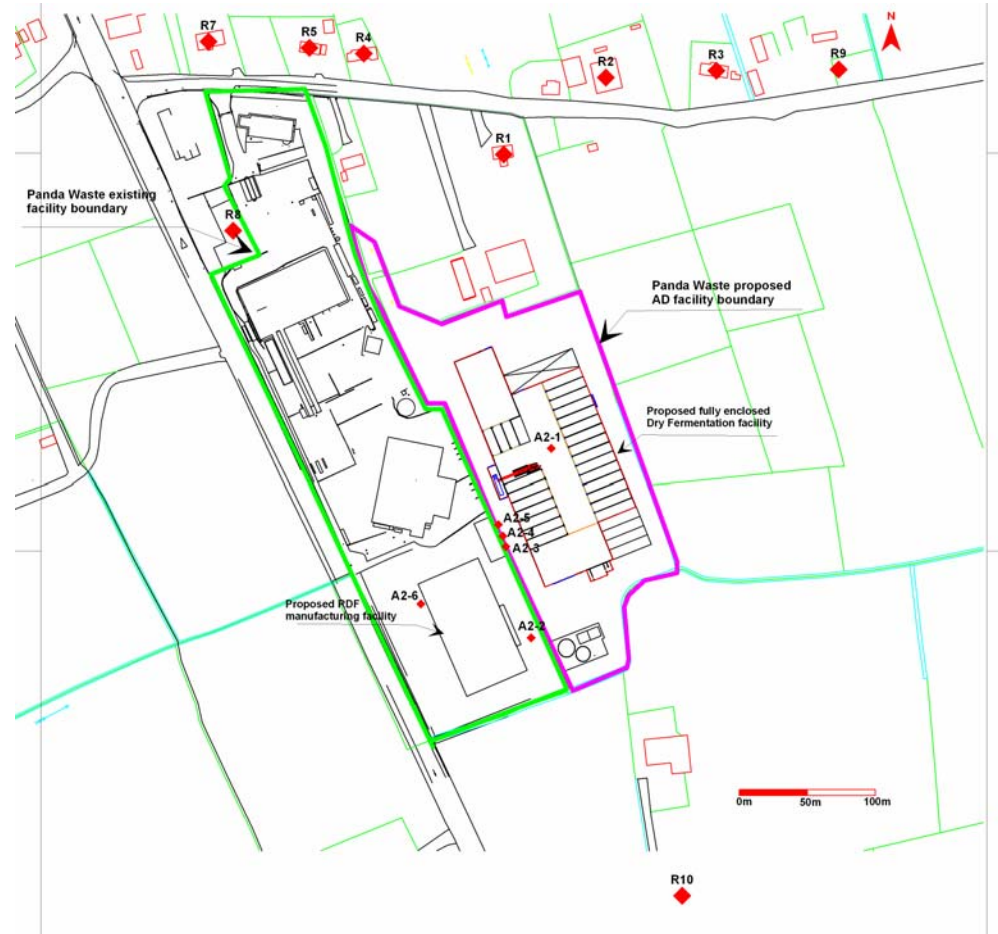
Aerial diagram of proposed Panda Waste Dry Fermentation and RDF Facility design and proposed boundary ()
